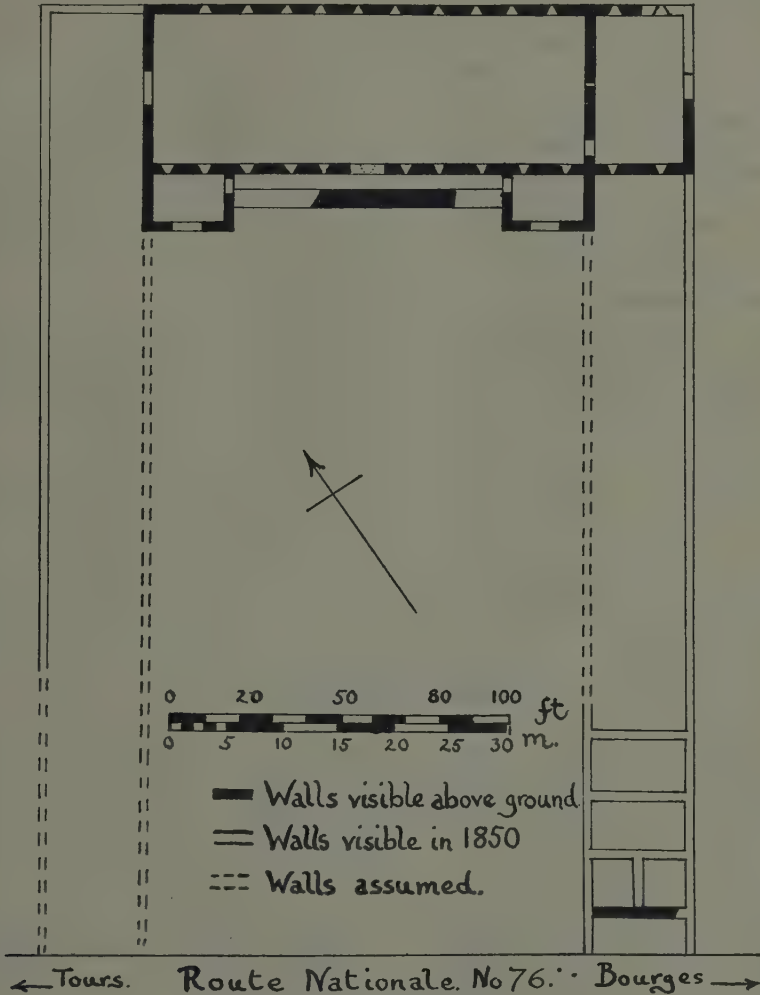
PLAN OF ROMAN BUILDING NEAR THÉSÉE, EAST OF TOURS
